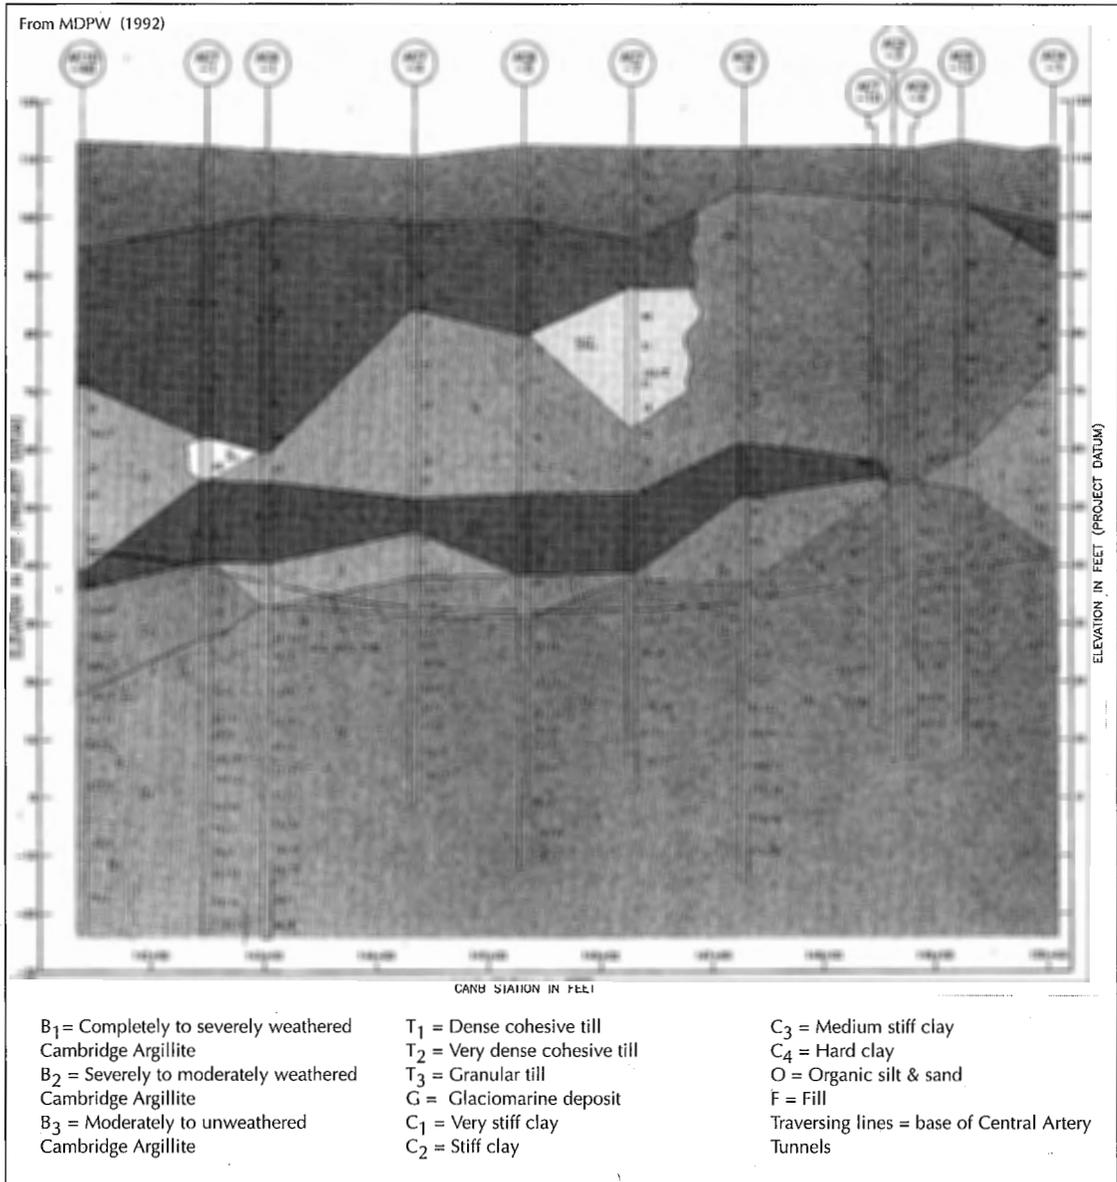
Section along the Central Artery Tunnel from Congress Street to Fleet Center near the Charles River, middle slurry wall between Stations 164+00 and 170+00 (view west to southwest).
